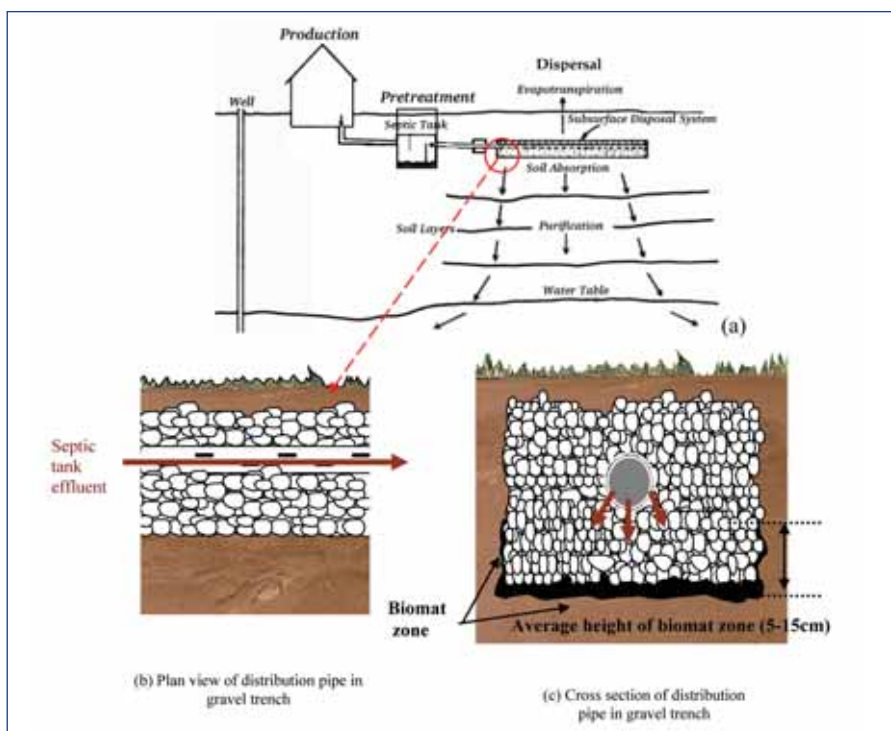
Schematic of layout and main processes (a); plan and cross section view of the trenches in a septic absorption system (b & c).
